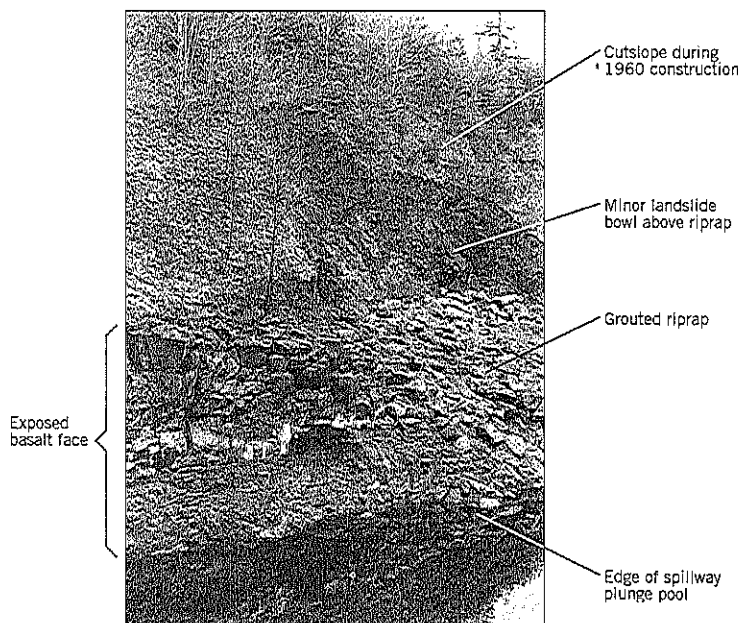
Grouted riprap (on right of photo) remediate an erosional landslide scar adjacent to the stilling basin of the 100-foot-high Bull Run Dam No. 2 spillway, Oregon.
